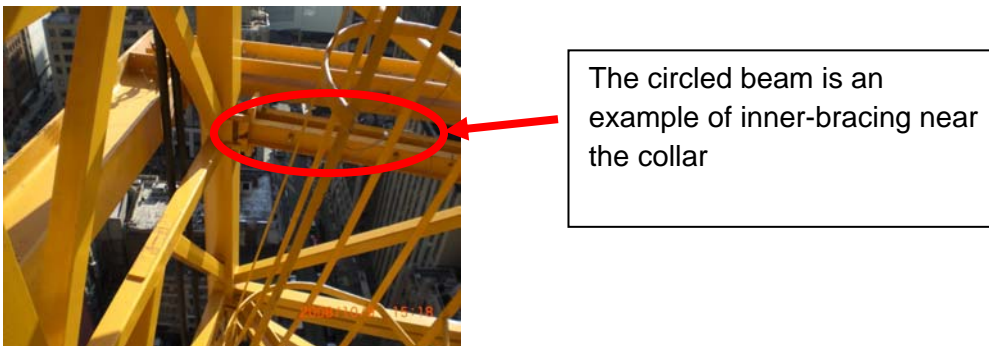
Example of Tower Reinforcement at Tie-in (Site C-78, 10/9/08).
